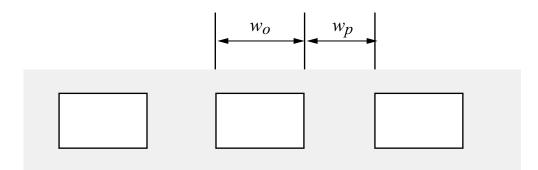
A cross section through a series of long caverns and rib pillars.
